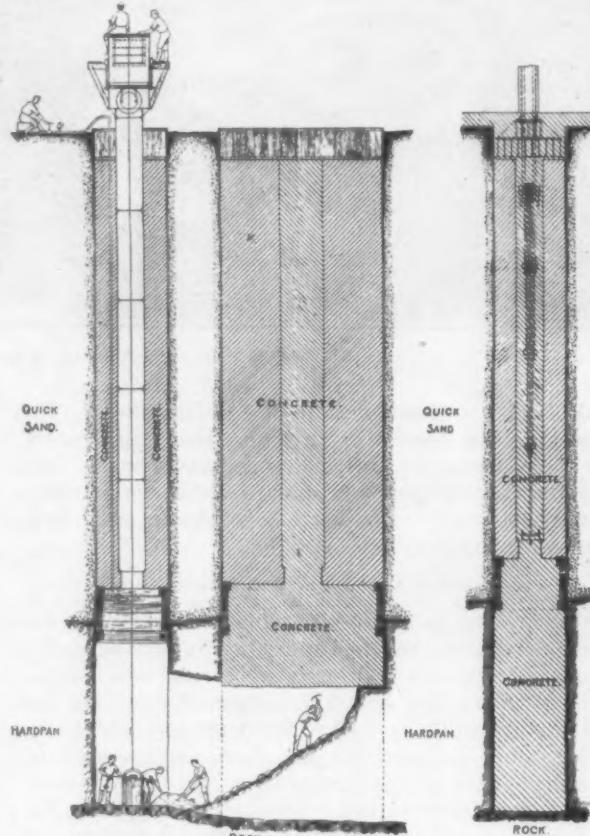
Vertical Sections Showing an Interesting Piece of Work in Connection with the Singer Tower Foundation.
